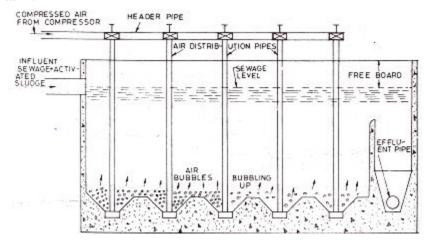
L-section of a ridge and furrow type of an aeration tank
